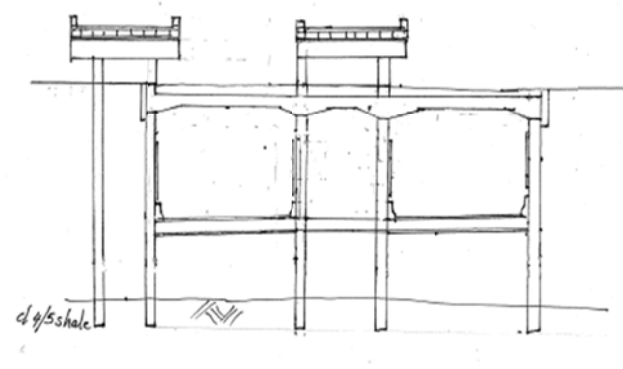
M5 Bayview Typical C&C Structure with elevated ramp connections
